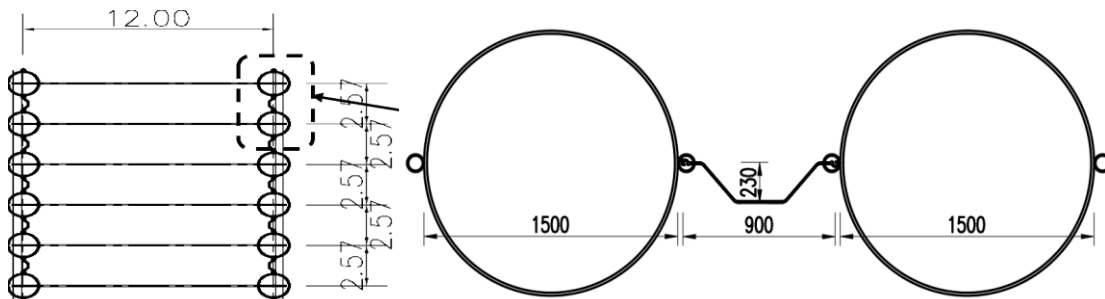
Plan, cross section of combined pipeboard – steel sheet pile wall, D1500x17+NS-SP-10H
